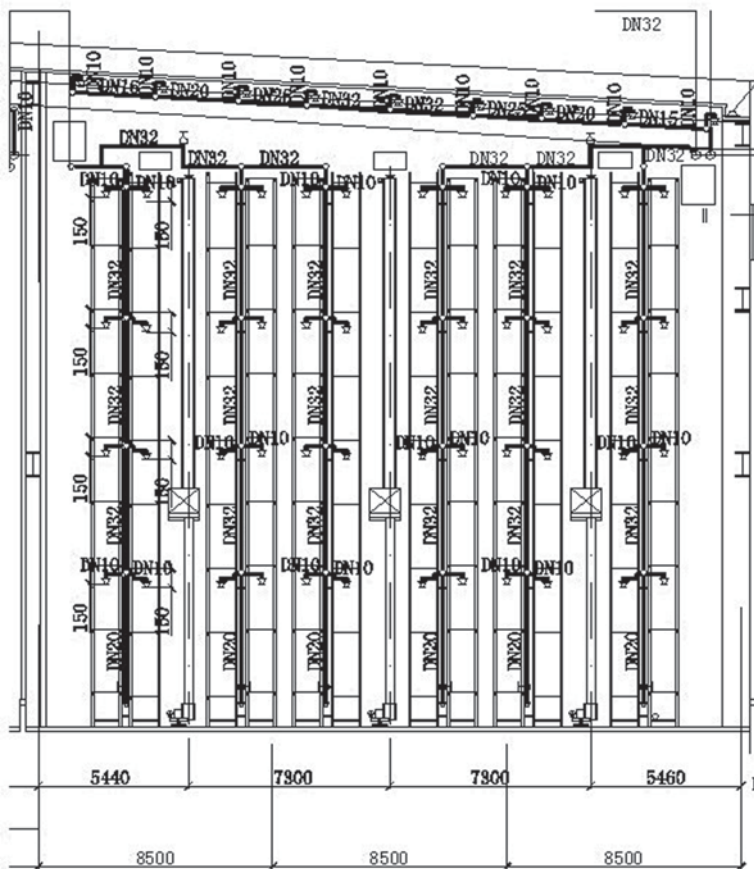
Shelves and roof cross-section of the nozzle arrangement (mm)
